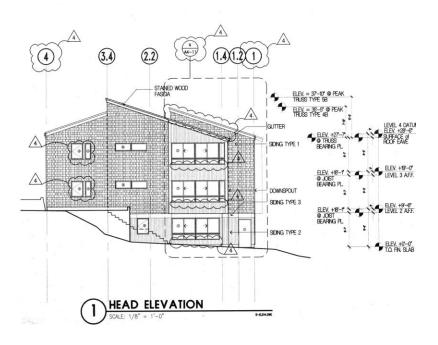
Exterior Transverse Elevation (Typical Both Sides)
